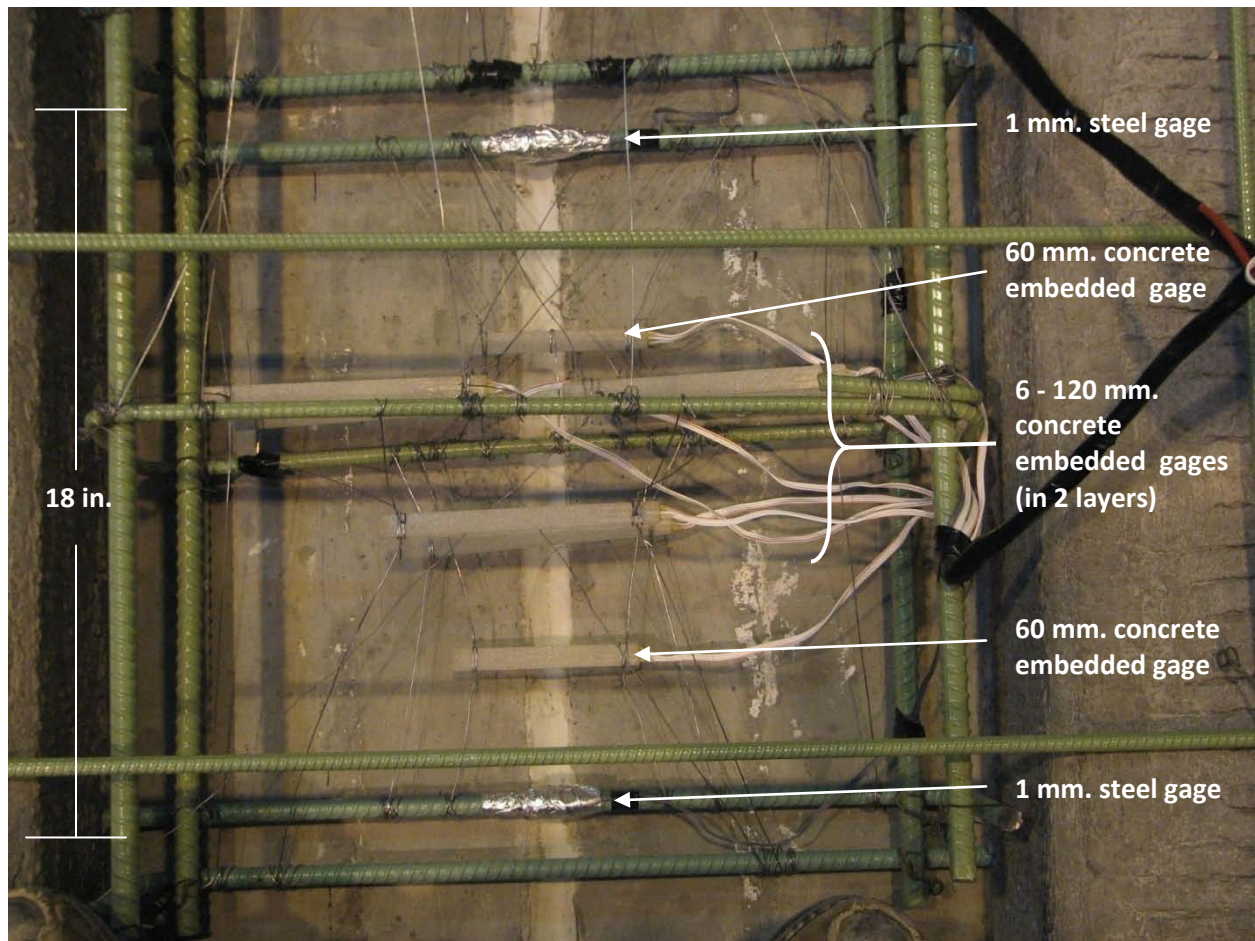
Plan view of instrumentation near origin face of subassembly specimens
